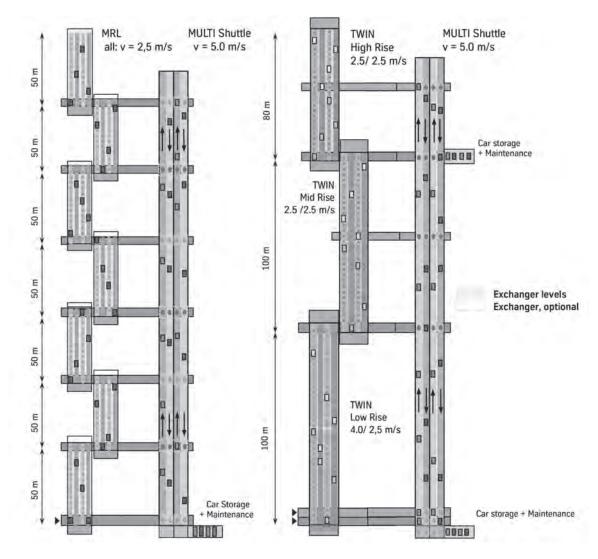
MULTI – project applications (Source: thyssenkrupp Elevator) 图8. MULTI--项目应用(来源:蒂森克虏伯电梯集团)
